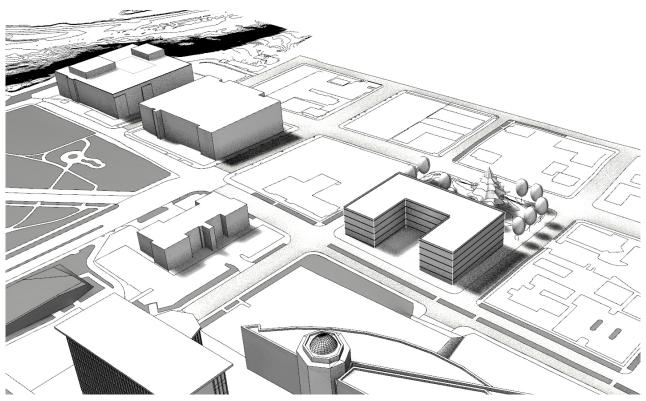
ALTERNATIVE 12.B - NEW EXECUTIVE OFFICE BUILDING
